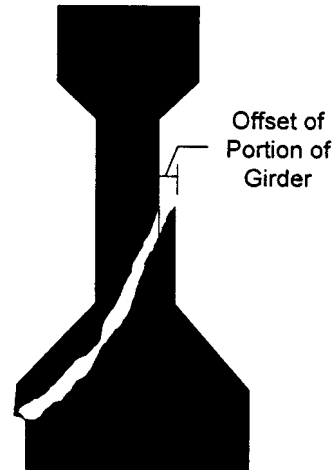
Schematic of concrete damage showing offset portion of damaged girder
